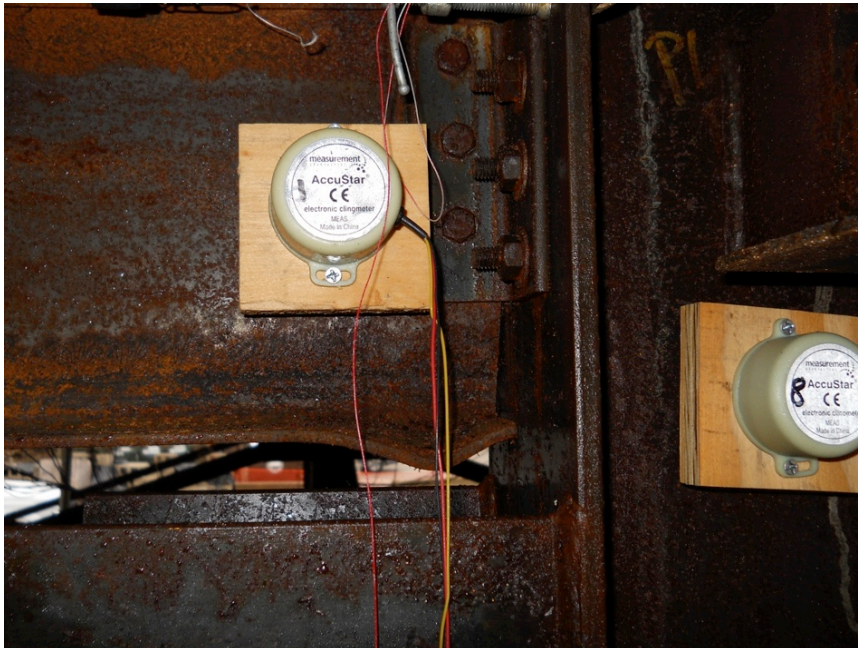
EC-B Test Evidence of Girder Flange Bearing on Column
